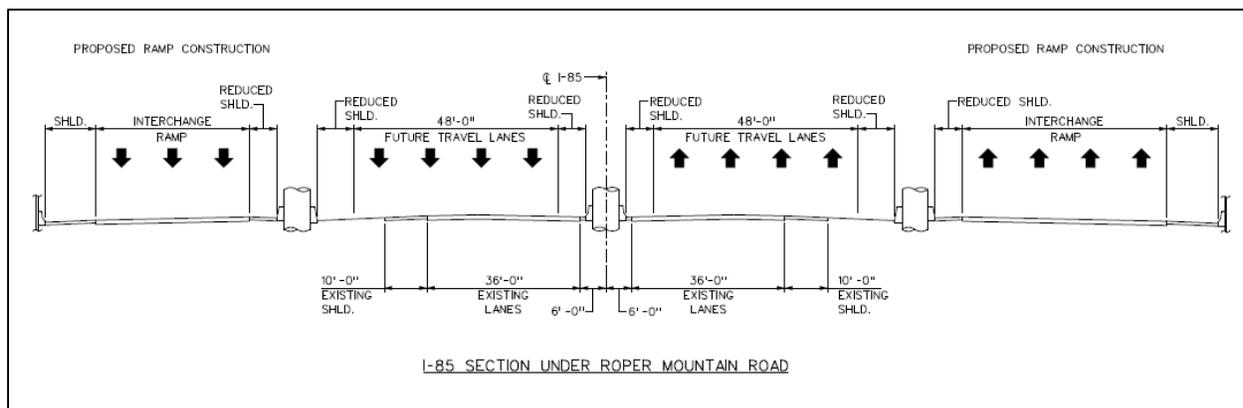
I-85 Future Typical Section under Roper Mountain Road
